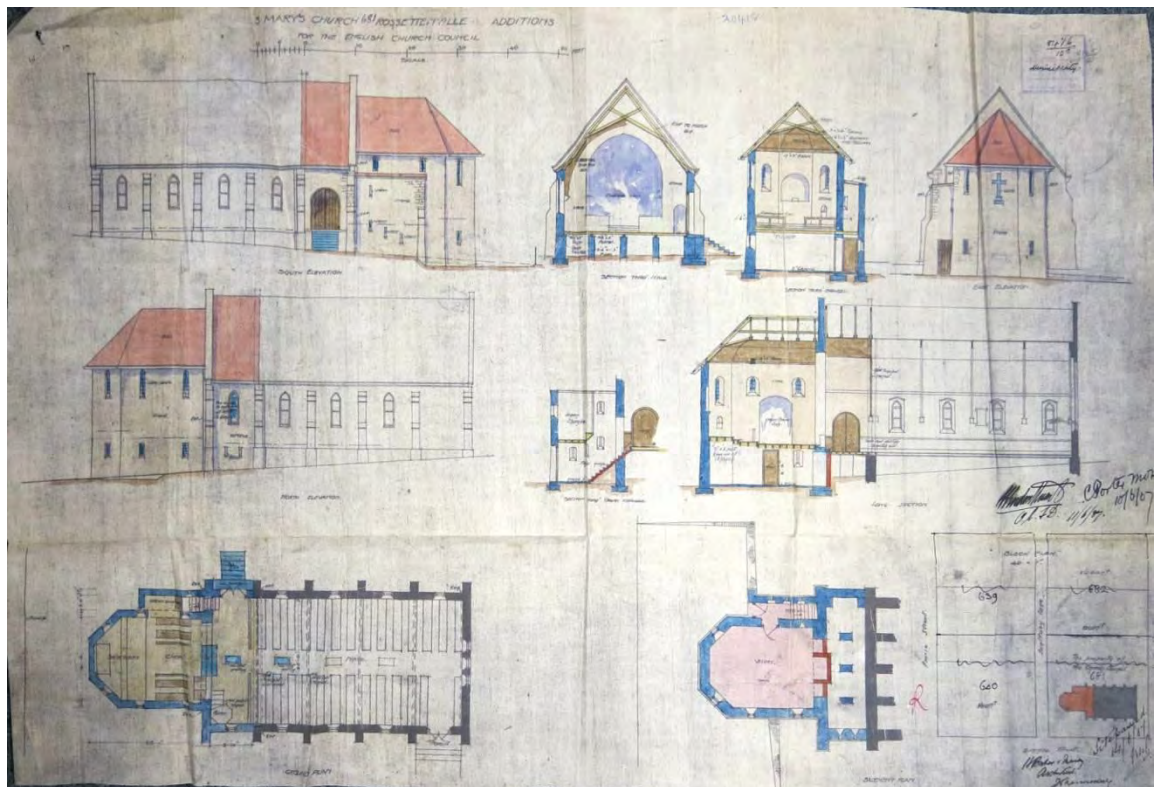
Additions to St Marys Church Rosettenville done by Baker and Fleming in 1907
